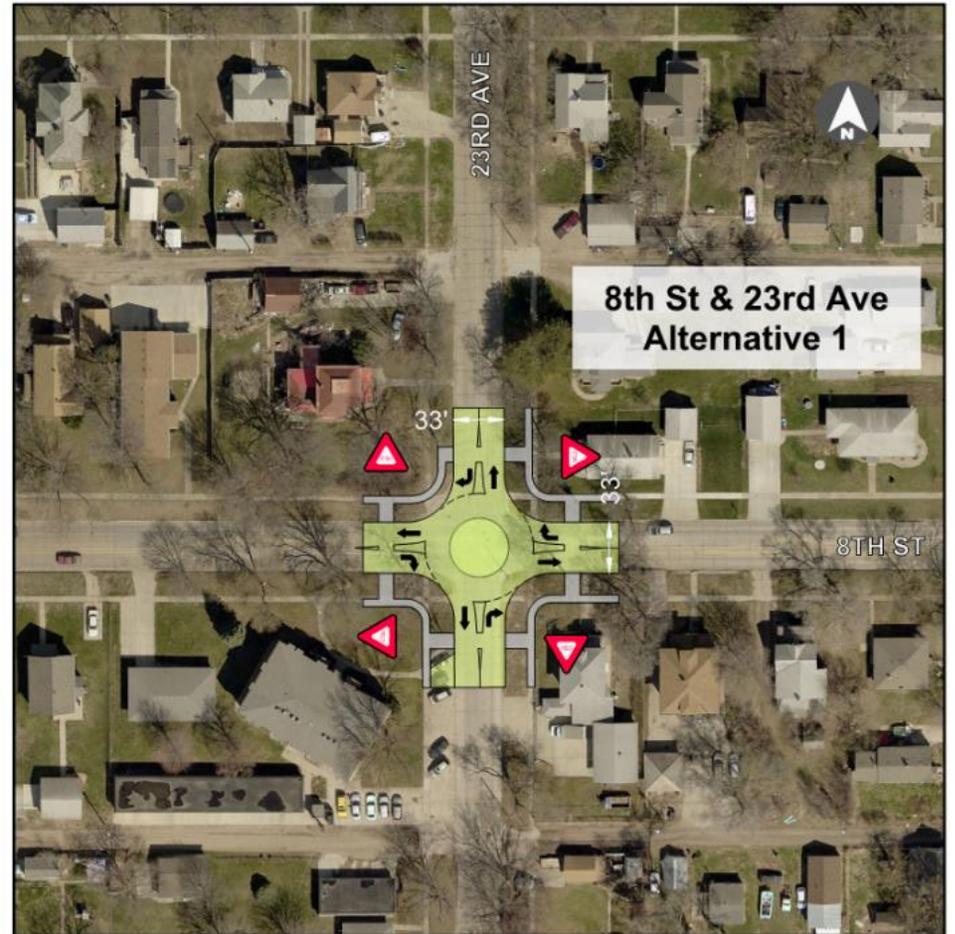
Alternative 1 – 23rd Avenue & 8th Street
